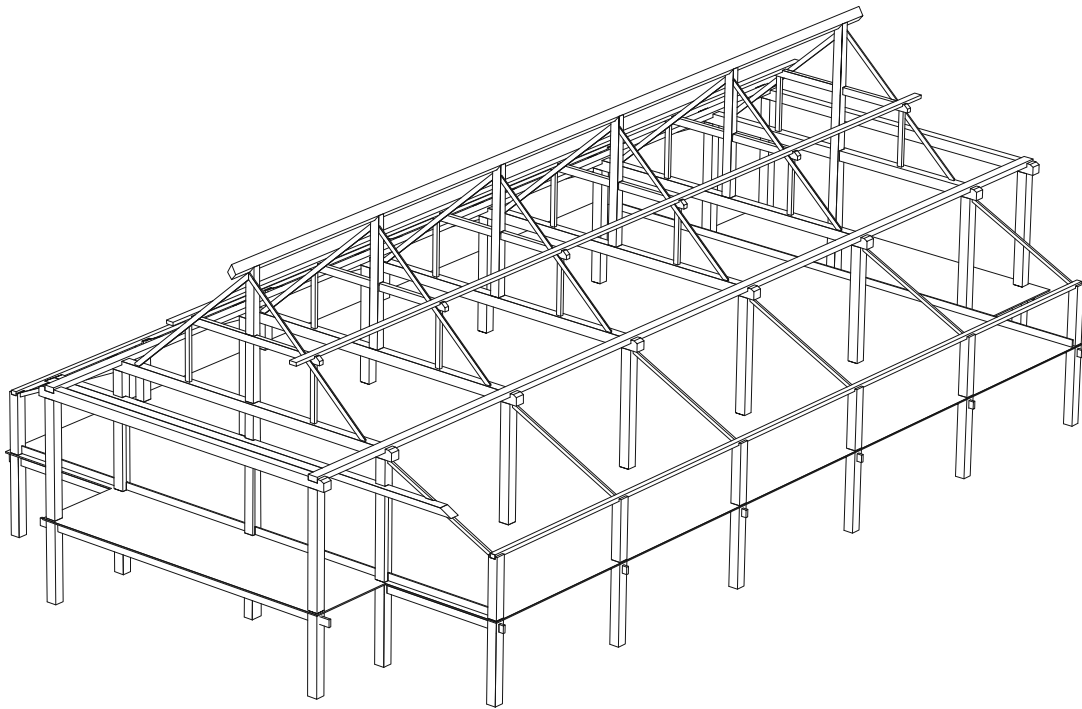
Axonometric view of a long house at the village of Baan Ngek showing main structural frames
